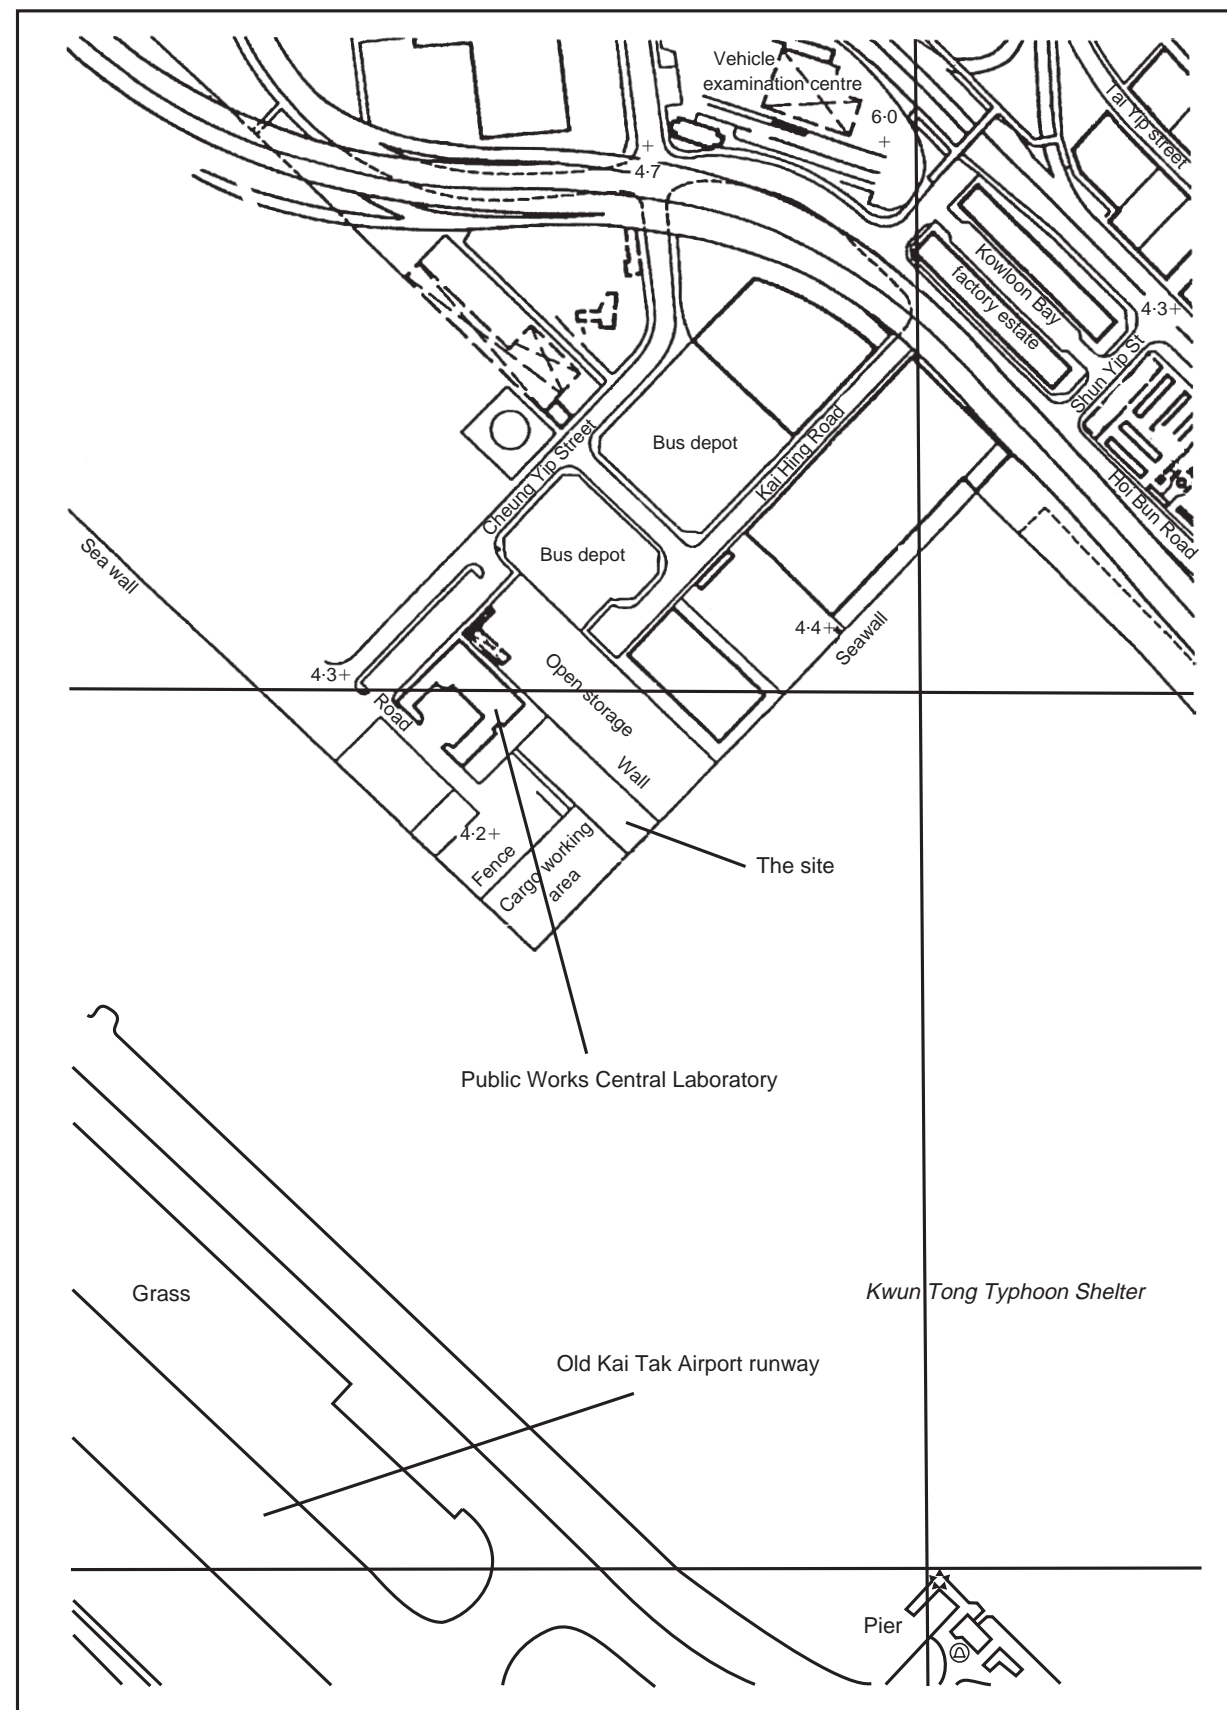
Location plan of test pile site in Kowloon, Hong Kong
